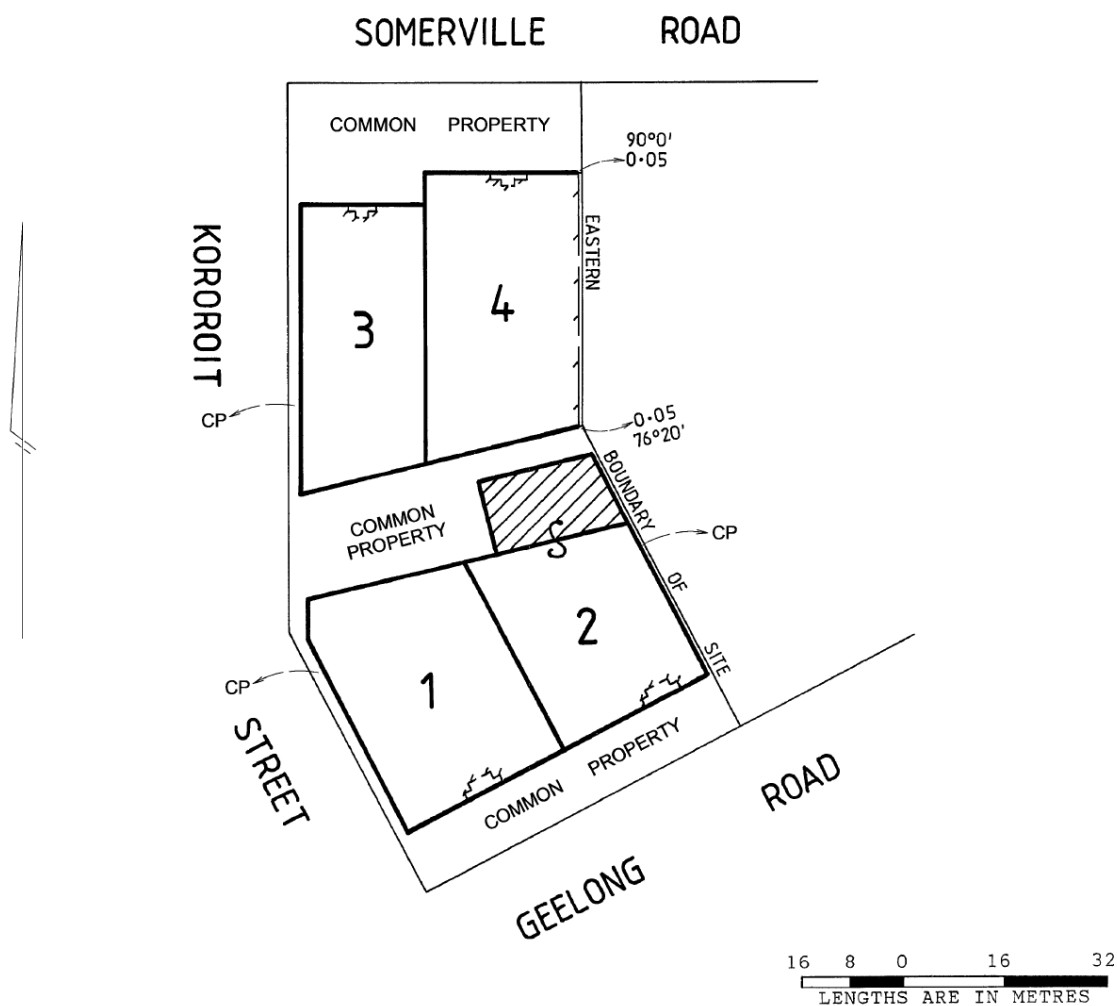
Lot 3 on Plan of Strata Subdivision 037133V.
